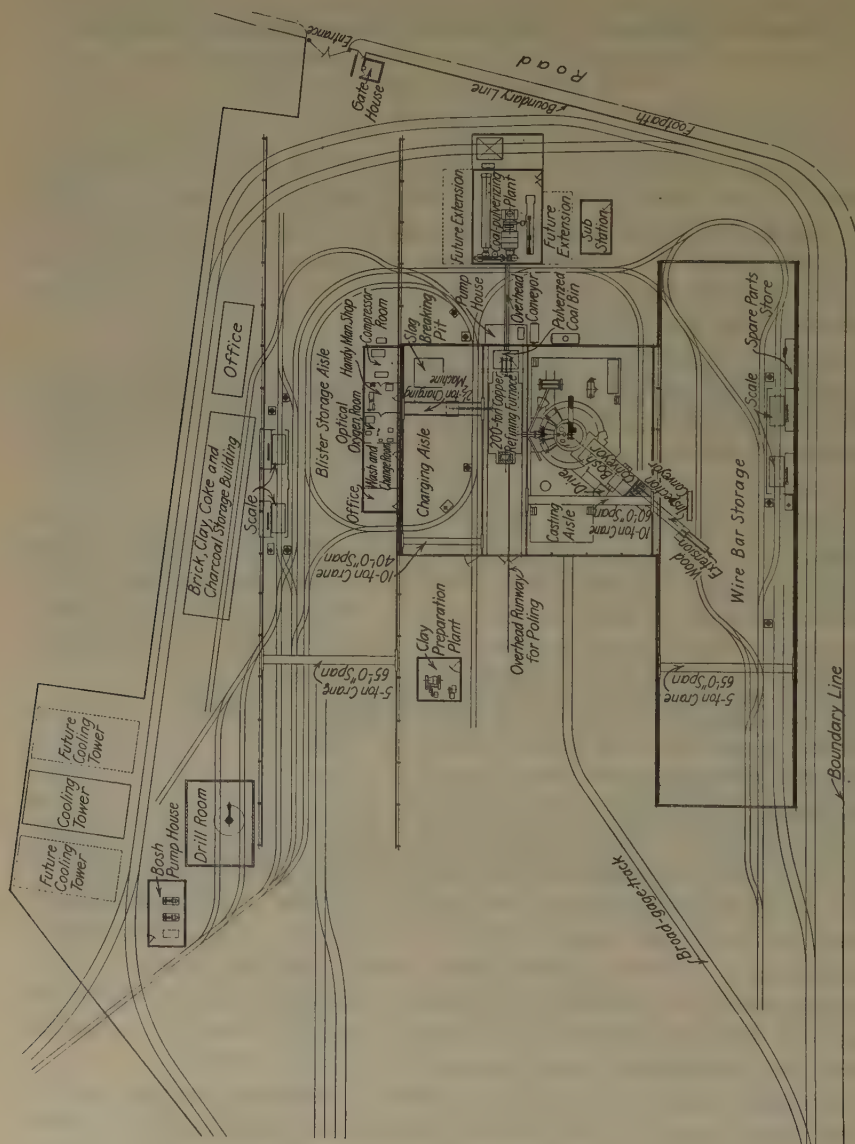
GENERAL PLANT LAYOUT, BRITISH COPPER REFINERS CO., LTD.
